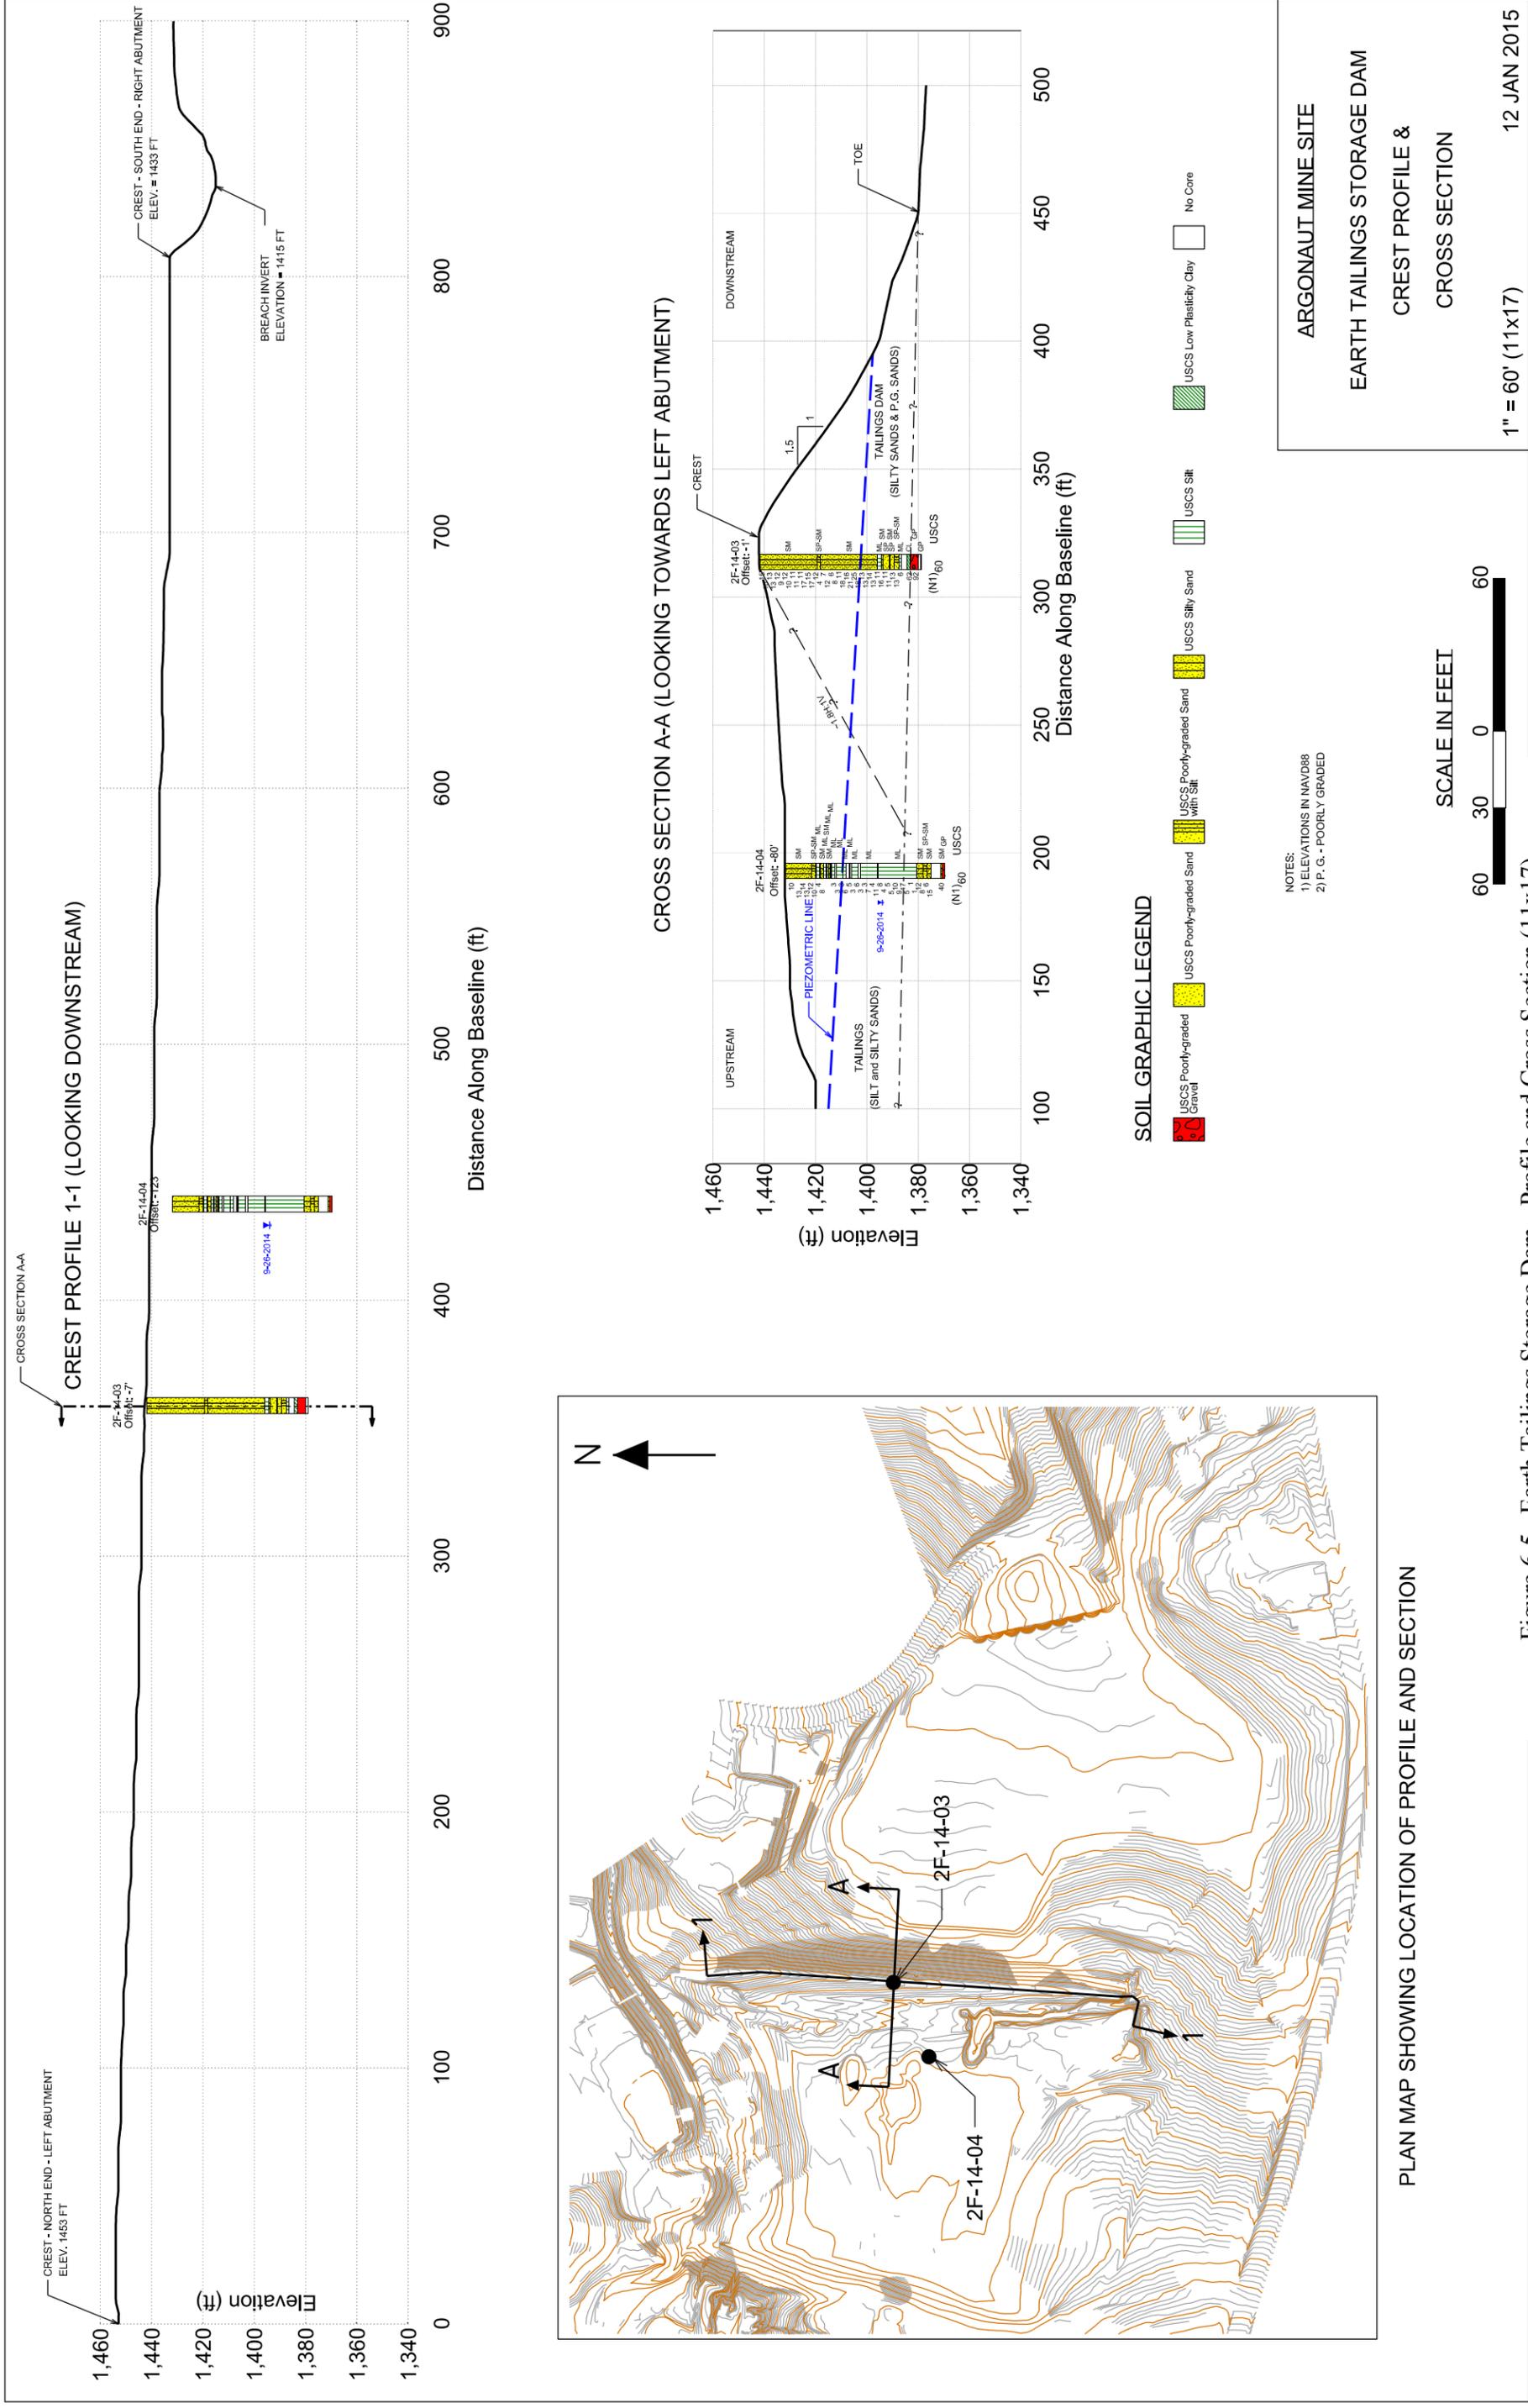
Earth Tailings Storage Dam - Profile and Cross Section (11x17)
